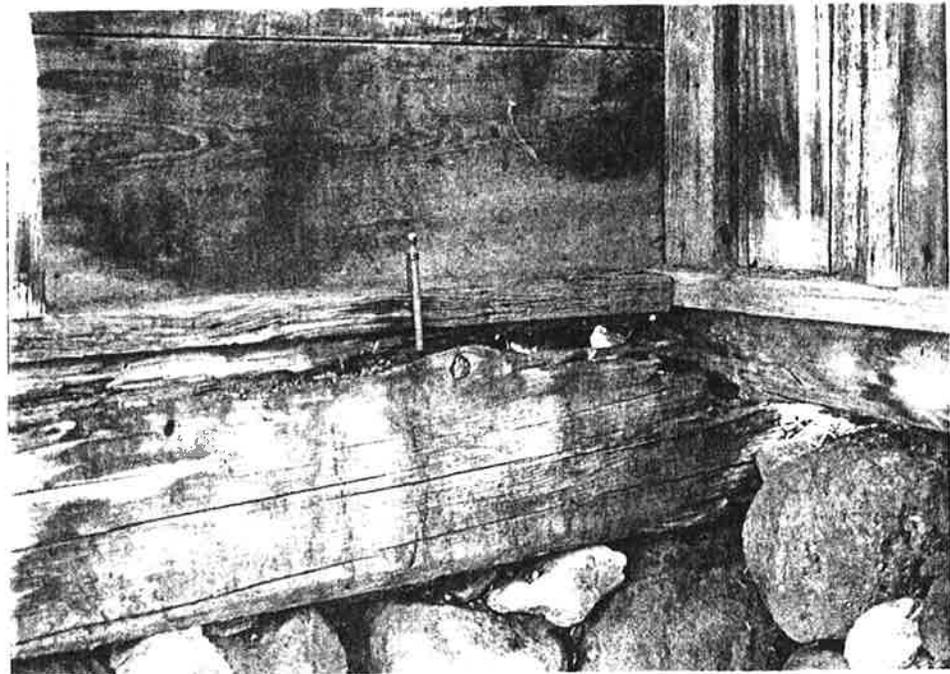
Birch Creek chicken house, interior view of south sill deterioration at southwest corner. (Neg. R2-20)
